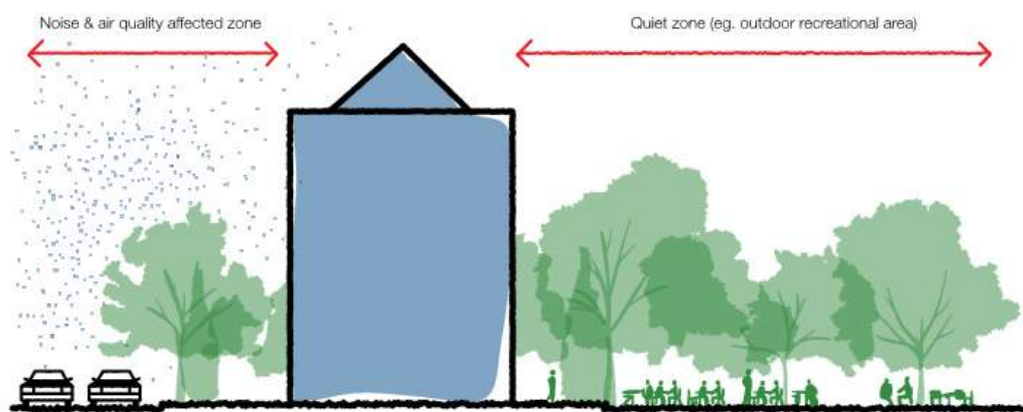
Outdoor spaces located away from noise and emissions (Source: NSW Department of Planning 2008)
